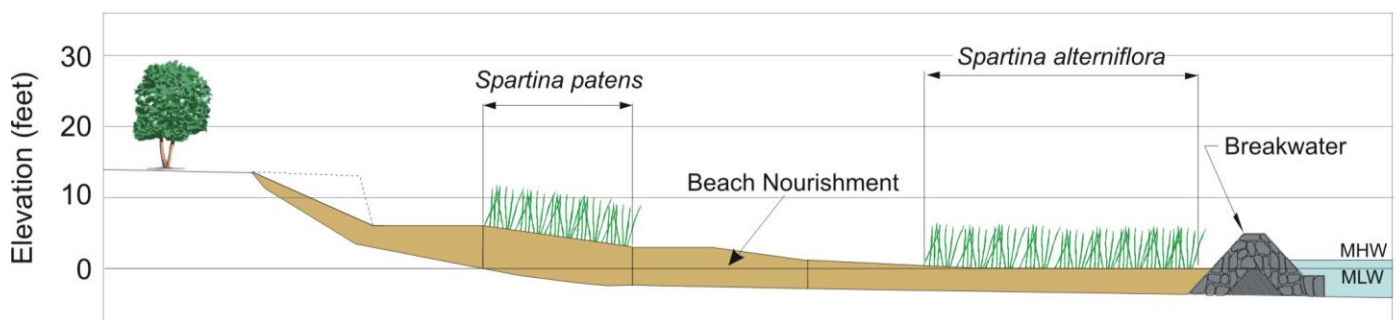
Typical living shoreline schematic depicting beach fill, low and high marsh plantings, and a protective breakwater or sill (From Hardaway and Byrne, 1999)
